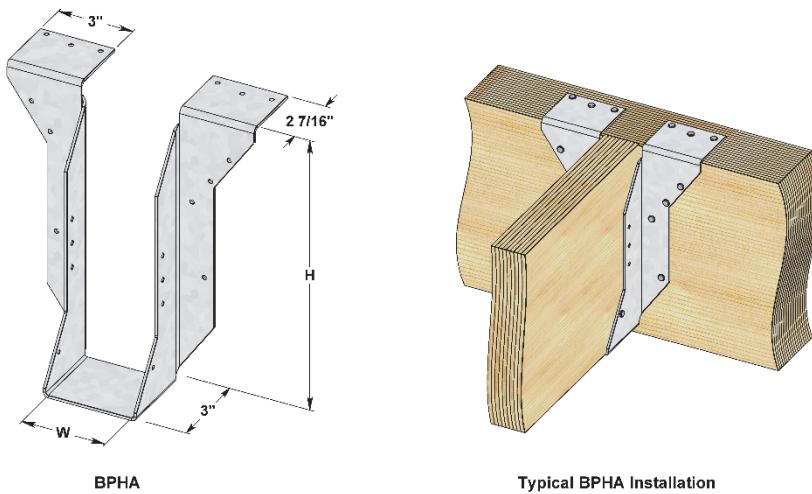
BPHA BEAM AND PURFLIN HANGER AND TYPICAL INSTALLATION DETAIL
